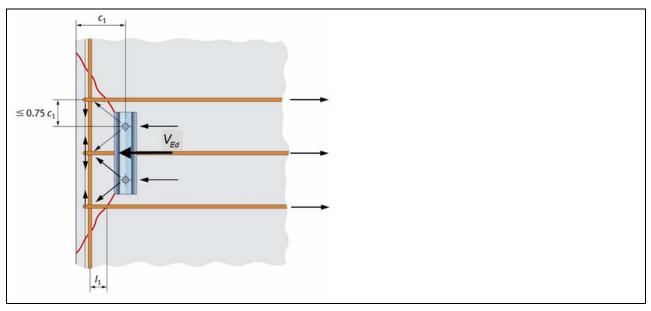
Surface reinforcement to take up shear forces with simplified strut and tie model to design edge reinforcement
